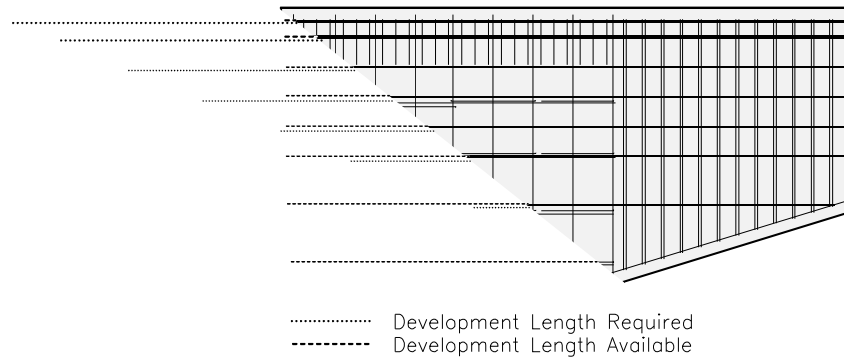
Available and Required Development Length of Overhang Reinforcement in Reinforced Concrete Bent
